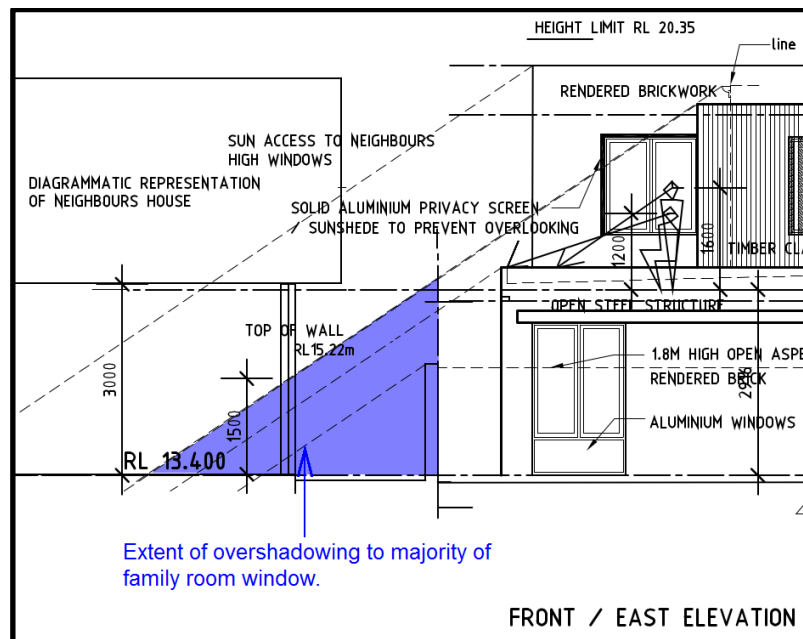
Overshadowing Section to the major opening to the southern adjoining site (27 Waverley Street)
